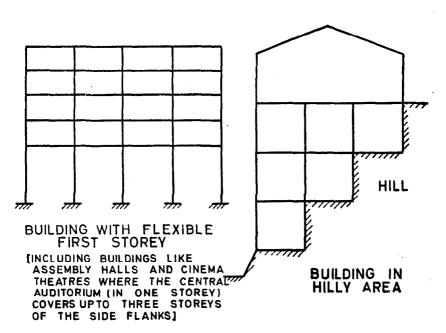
Buildings in Which Clause 4.2.1.1 Shall Not be Applicable
